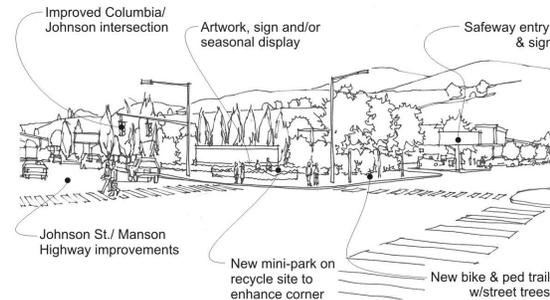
Example improvements at the Columbia Street/Johnson Street intersection.
